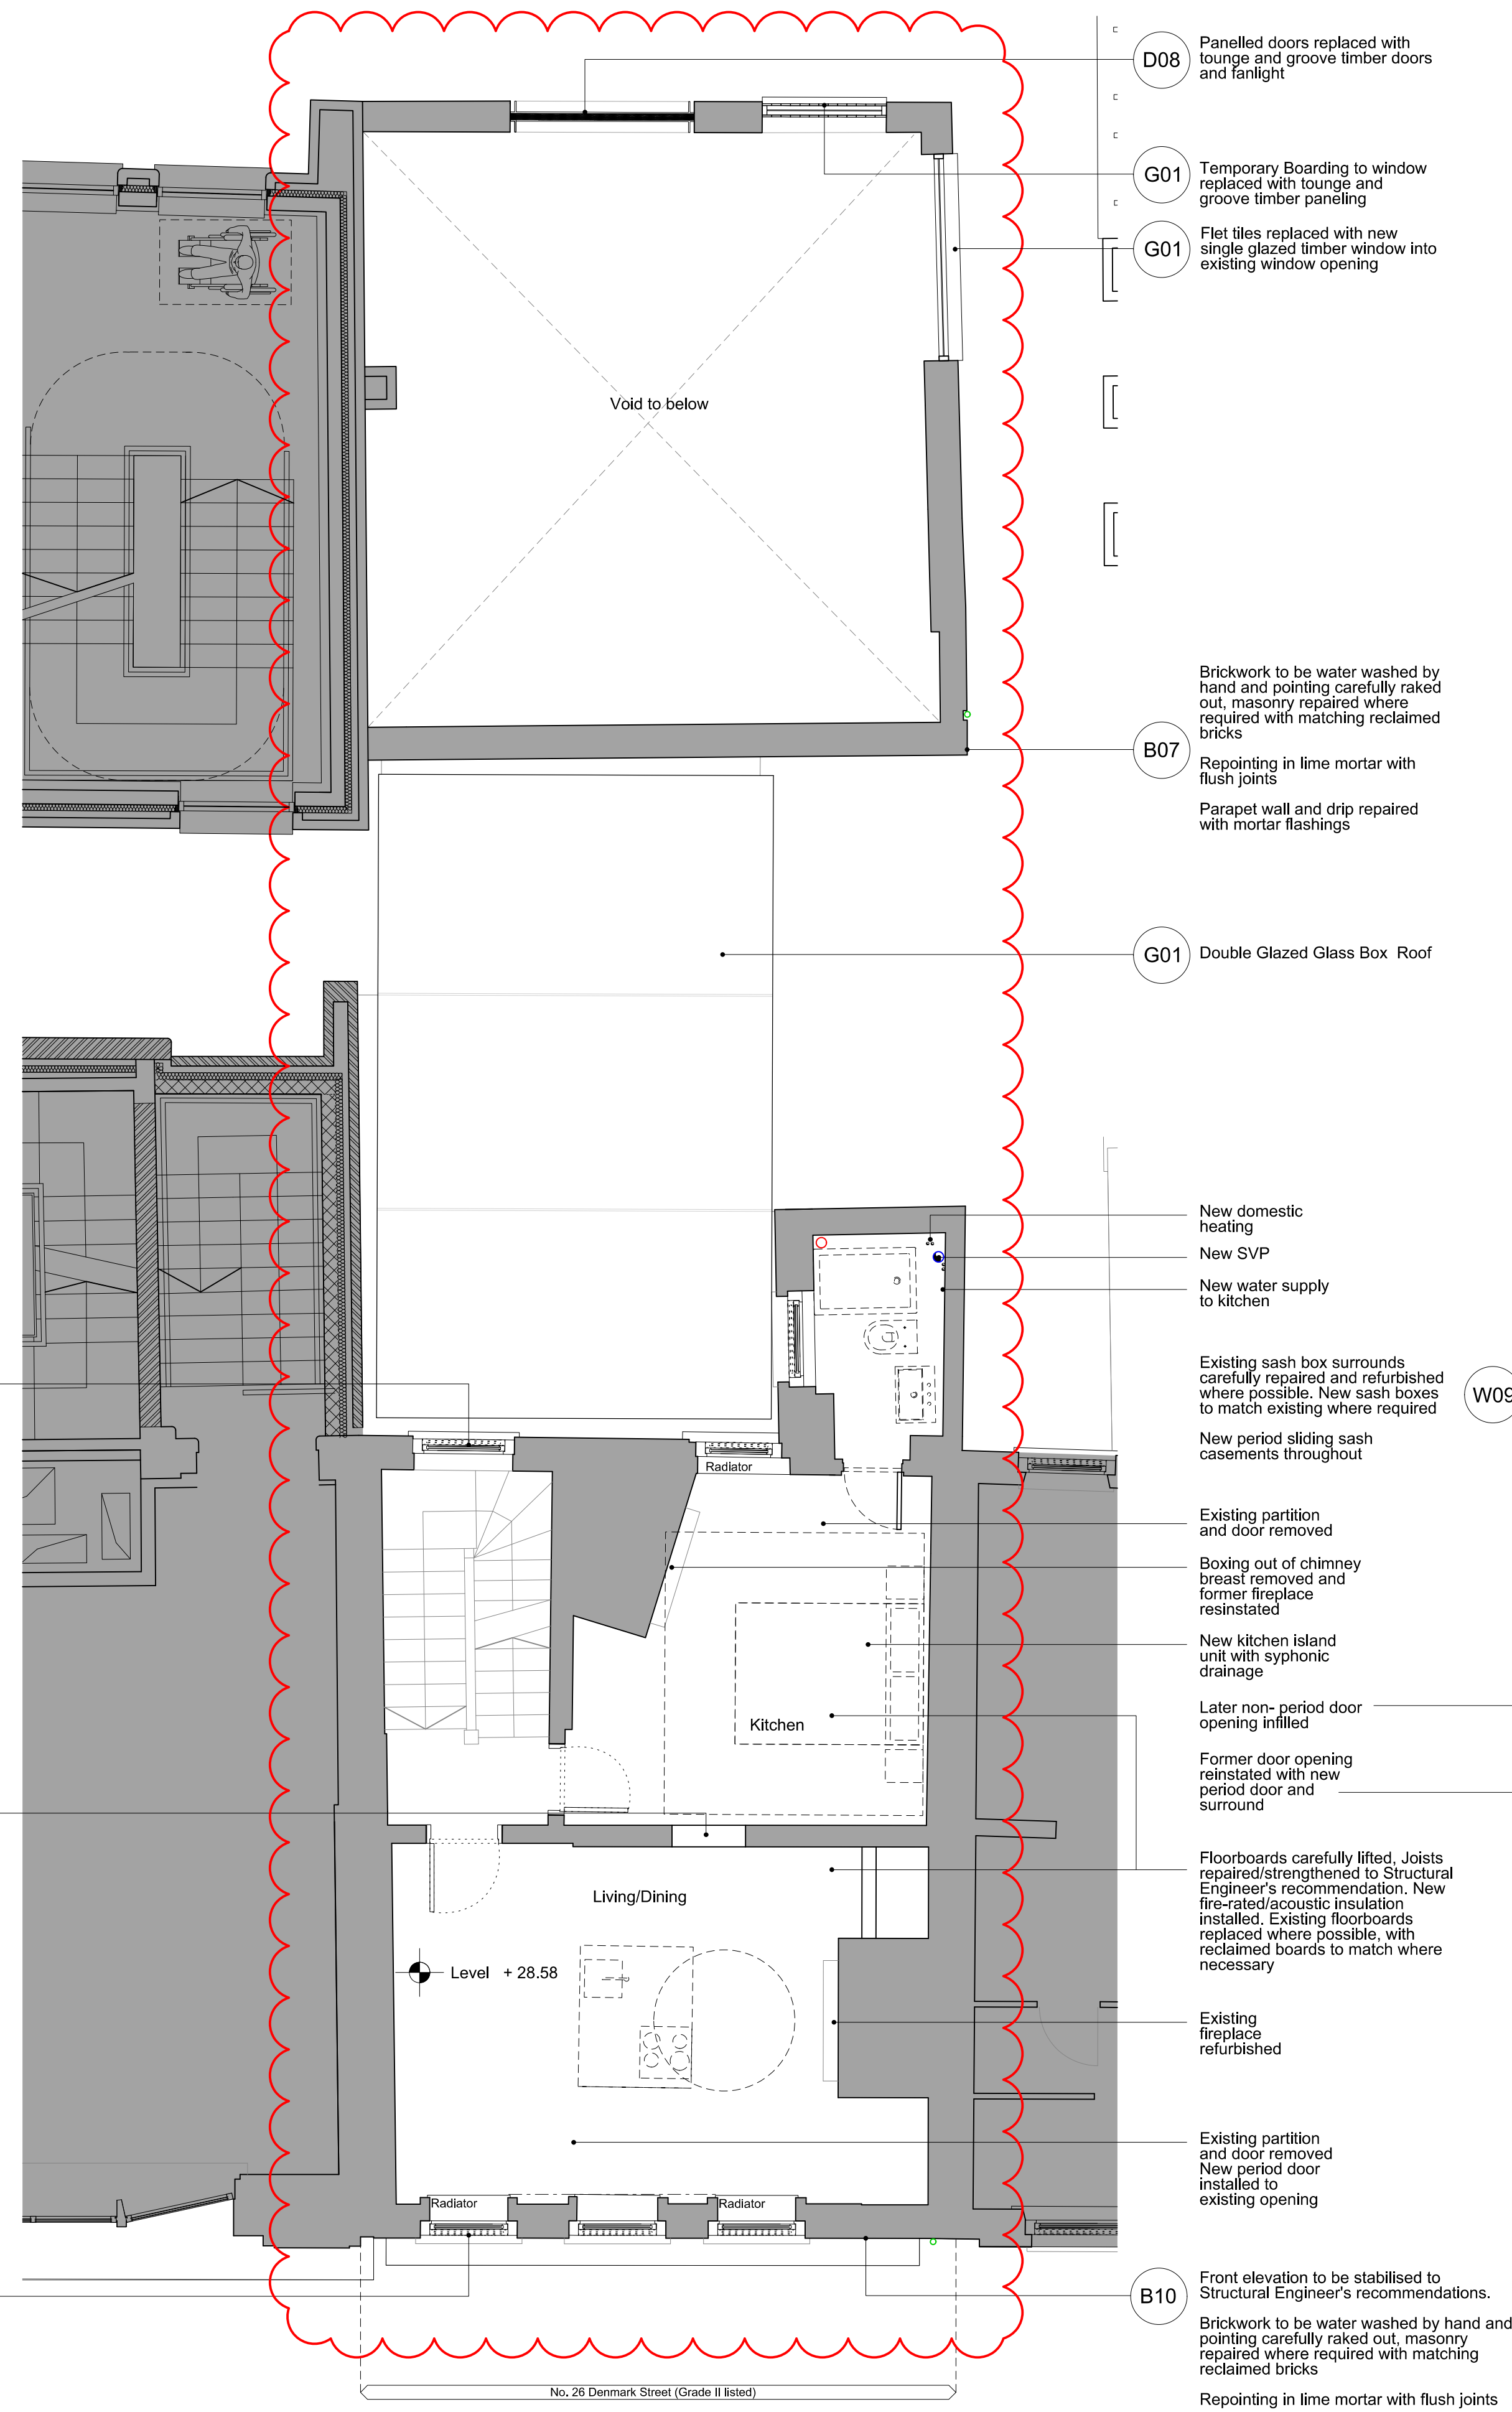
Drawing title No. 26 Denmark Street Proposed First & Second Floor plans
